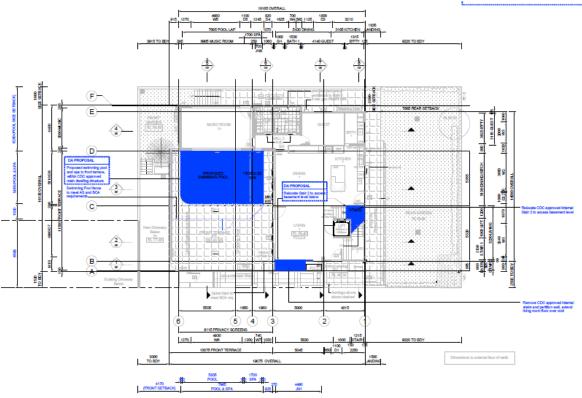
Proposed Ground Floor Plan (Not to Scale)
